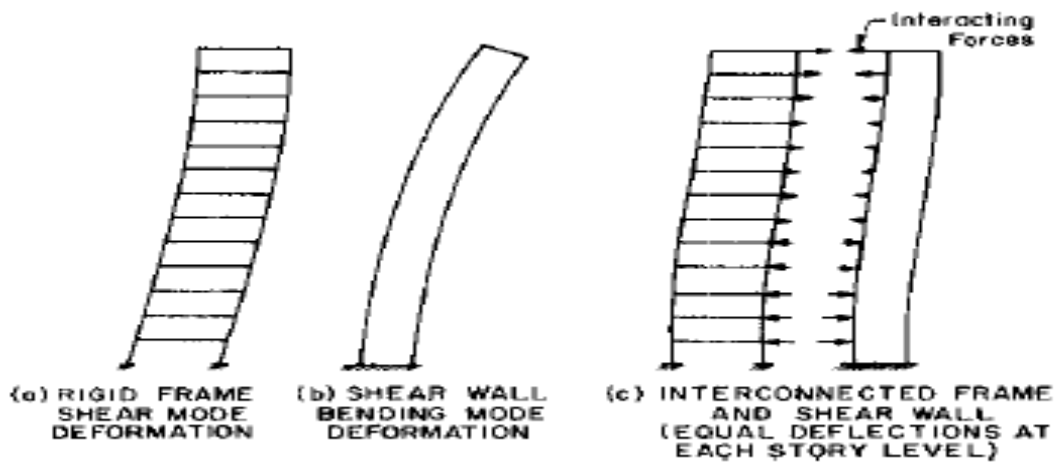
Deformation patterns due to lateral forces of a frame, a wall element and a dual system
